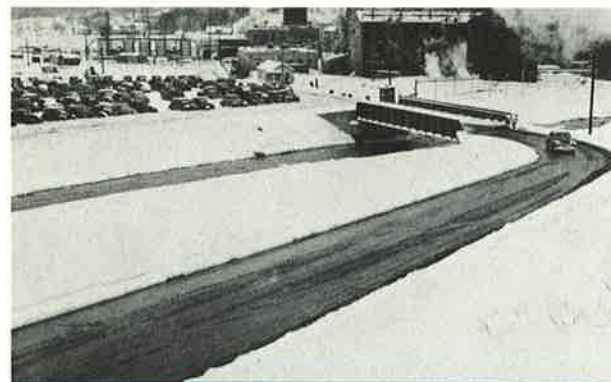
Waste heat keeps this road clear of snow at the Bridgeville, Pa., plant of American Cyanamid Co.
